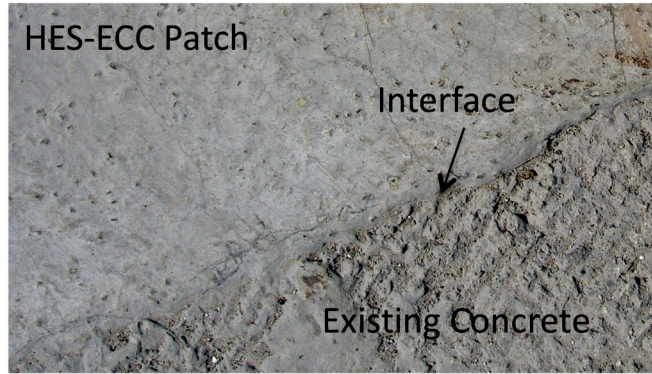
Interfacial delamination between HES-ECC patch repair and existing concrete, on September 18, 2009.
